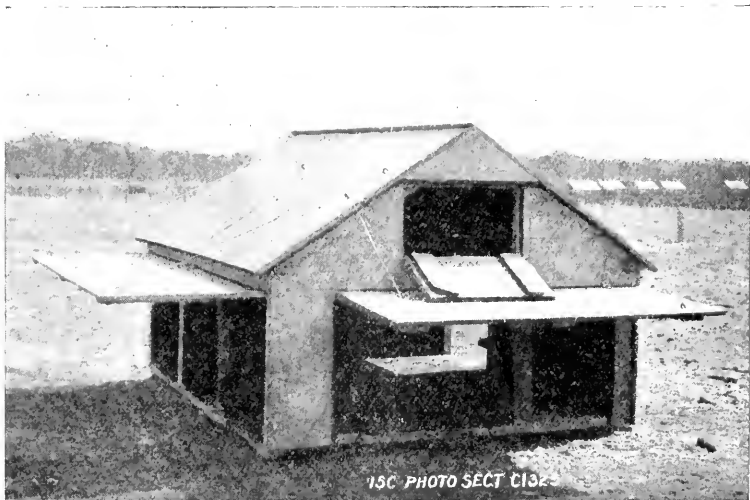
Iowa Gable Roof House in Summer Service. Side and End view, doors open; arranged for shade.
